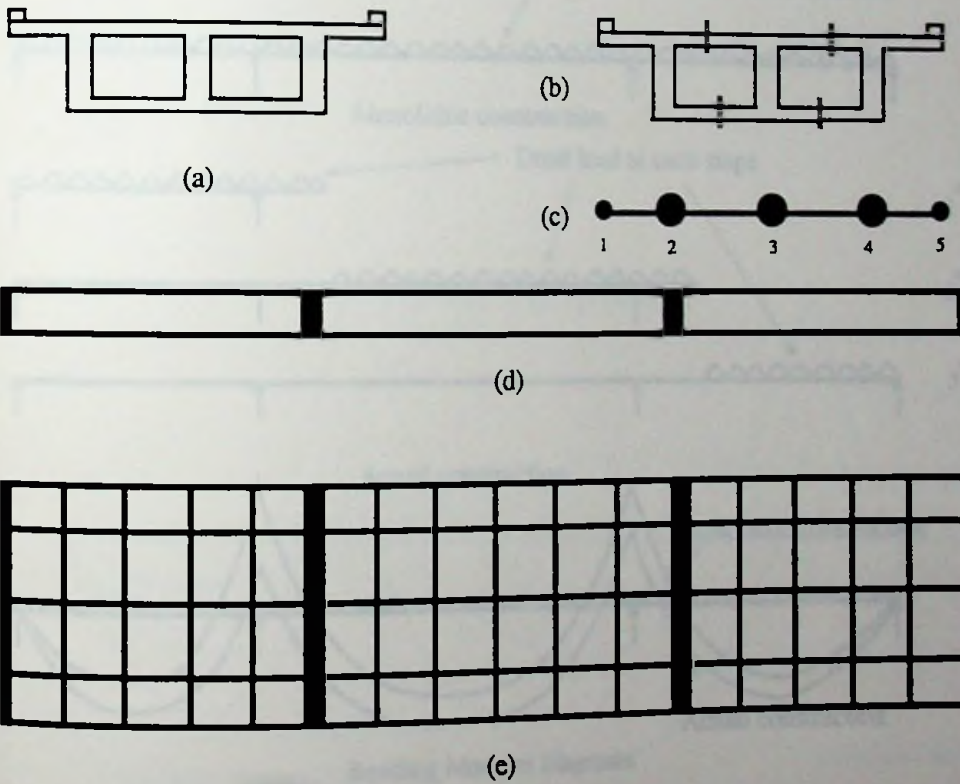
Grillage layout for a three span right, prismatic twin-cell concrete spine beam deck. (a) Deck section. (b) Grillage beams. (c) Grillage section. (d) Deck longitudinal section (e) Grillage mesh
